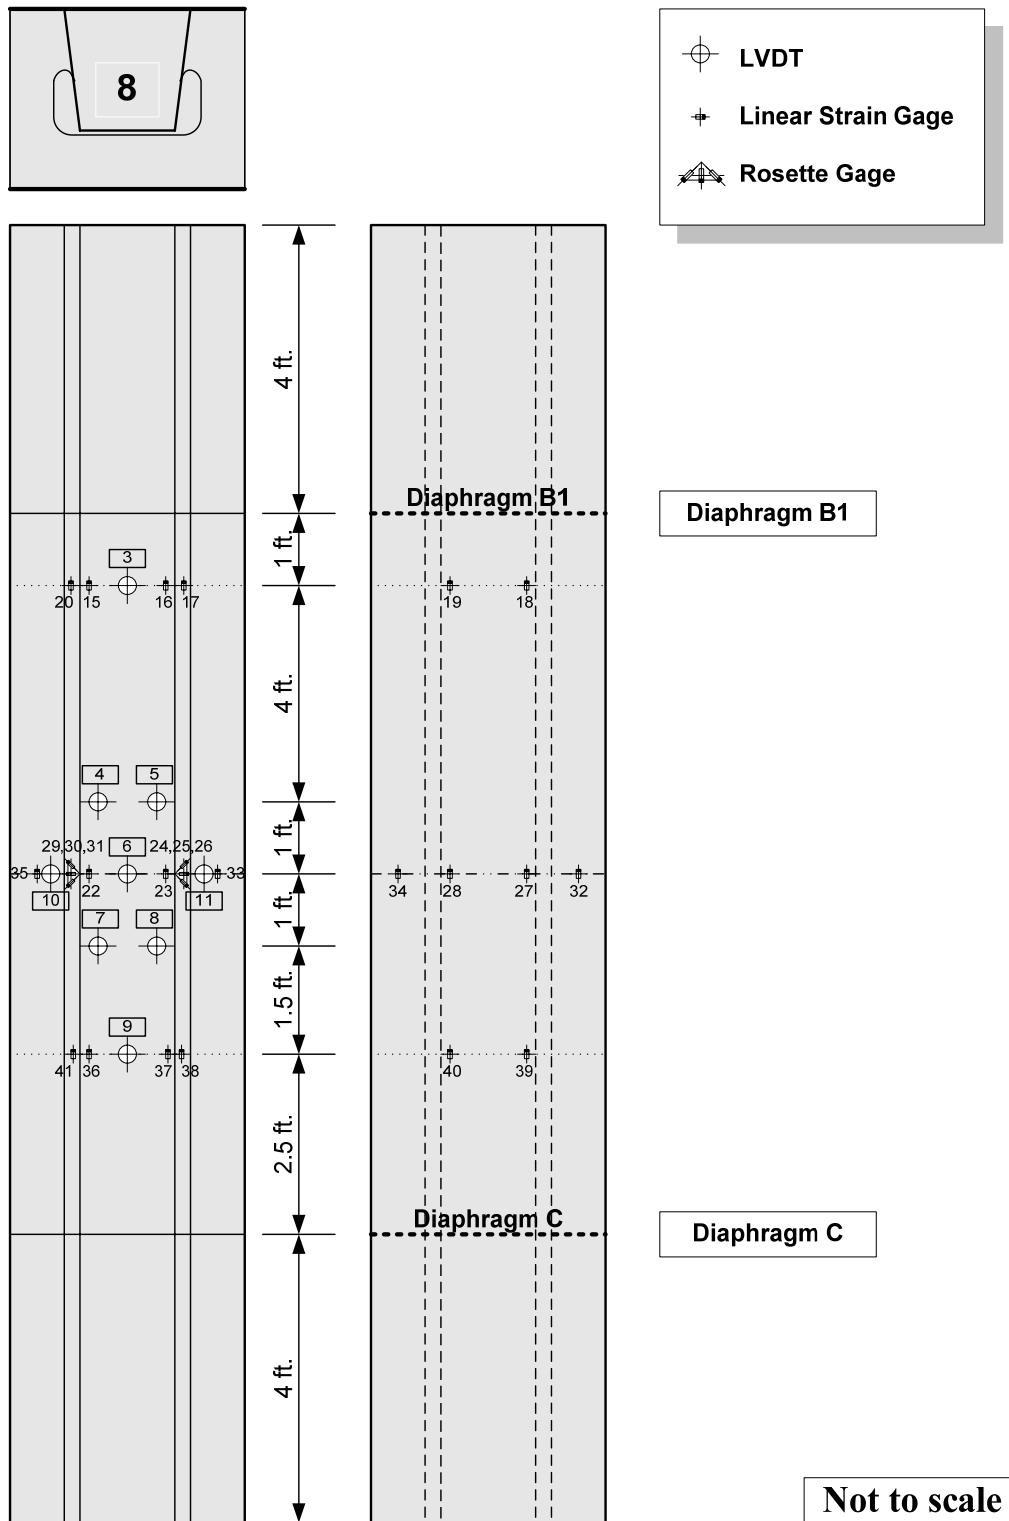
Instrumentation Plan for Single Rib Column, SC
